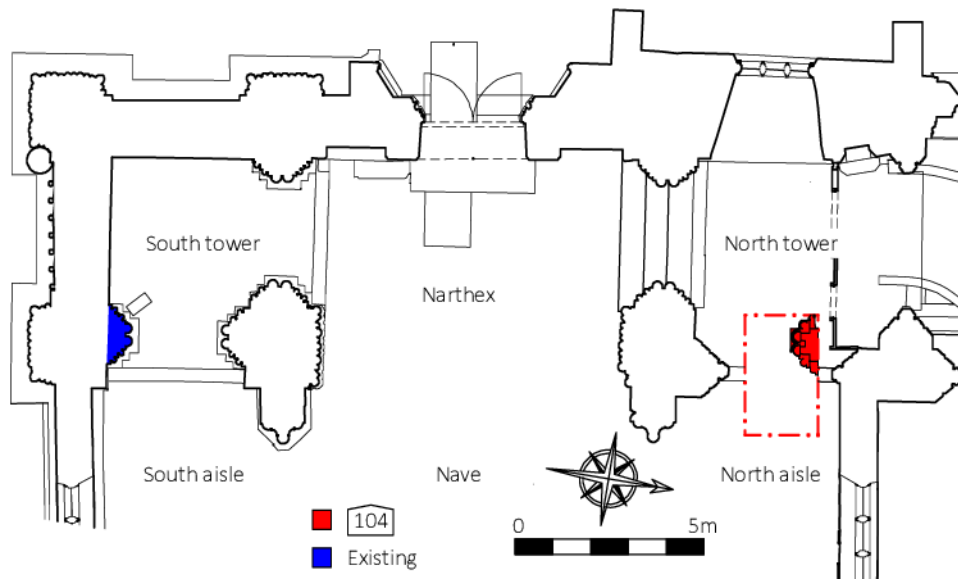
Location plan of [104] and its opposite counterpart (scale 1:200)
